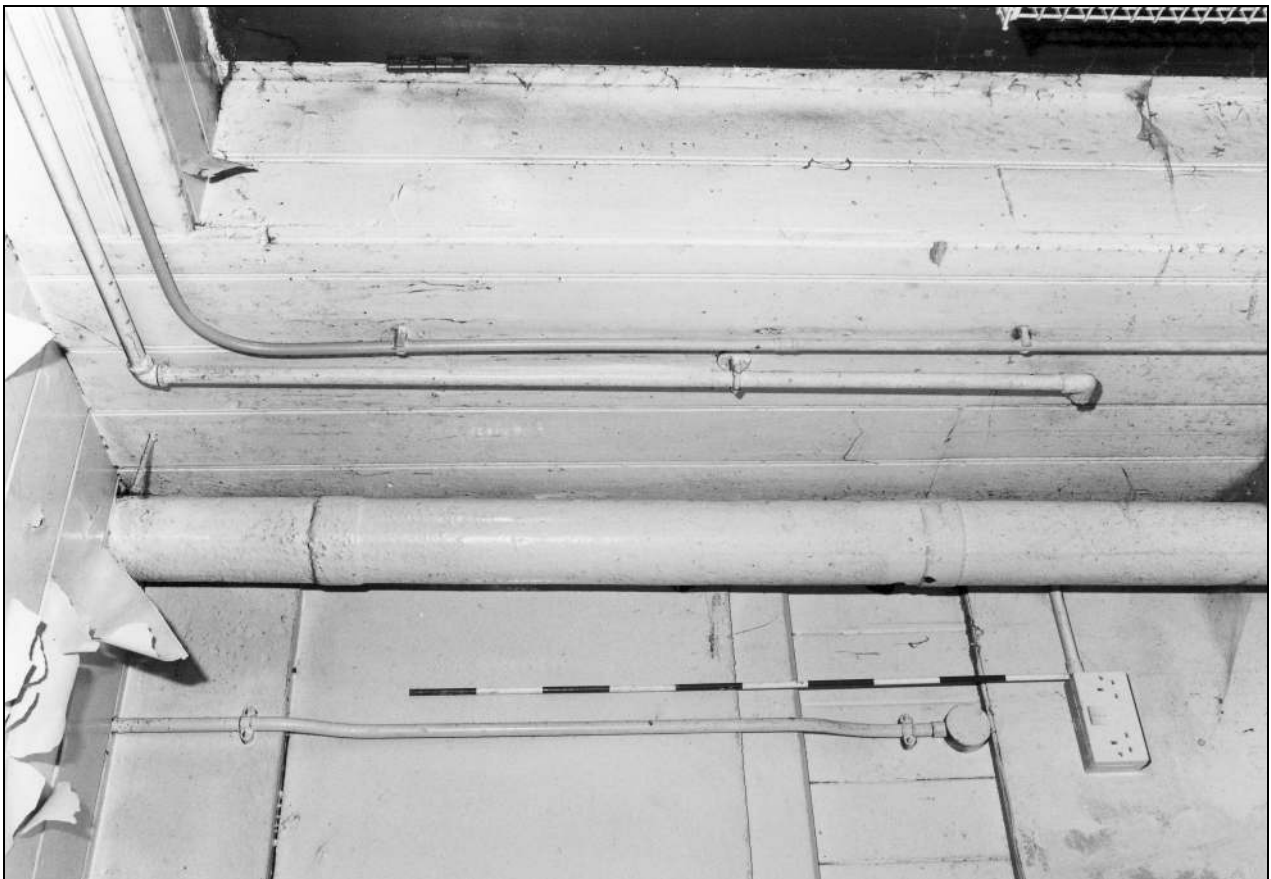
Bay 1: original feed pipe to tank (pipe no 5) (before refurbishment) (film 2, frame 13)
